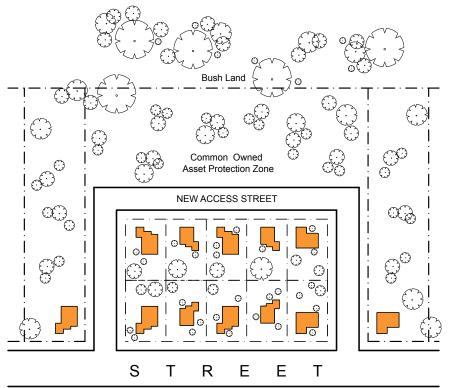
A.5-1. Subdivision of lots, sharing access road between development and APZ
